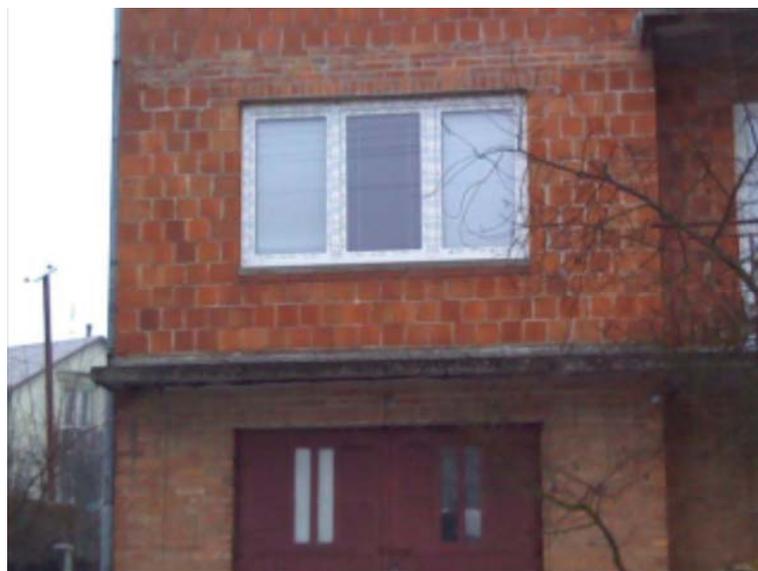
Digital photo of the west elevation of the 2nd building [authors resources]
